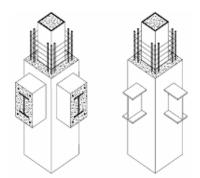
Combination of encased concrete-filled SRC columns with SRC beams or steel beams.
